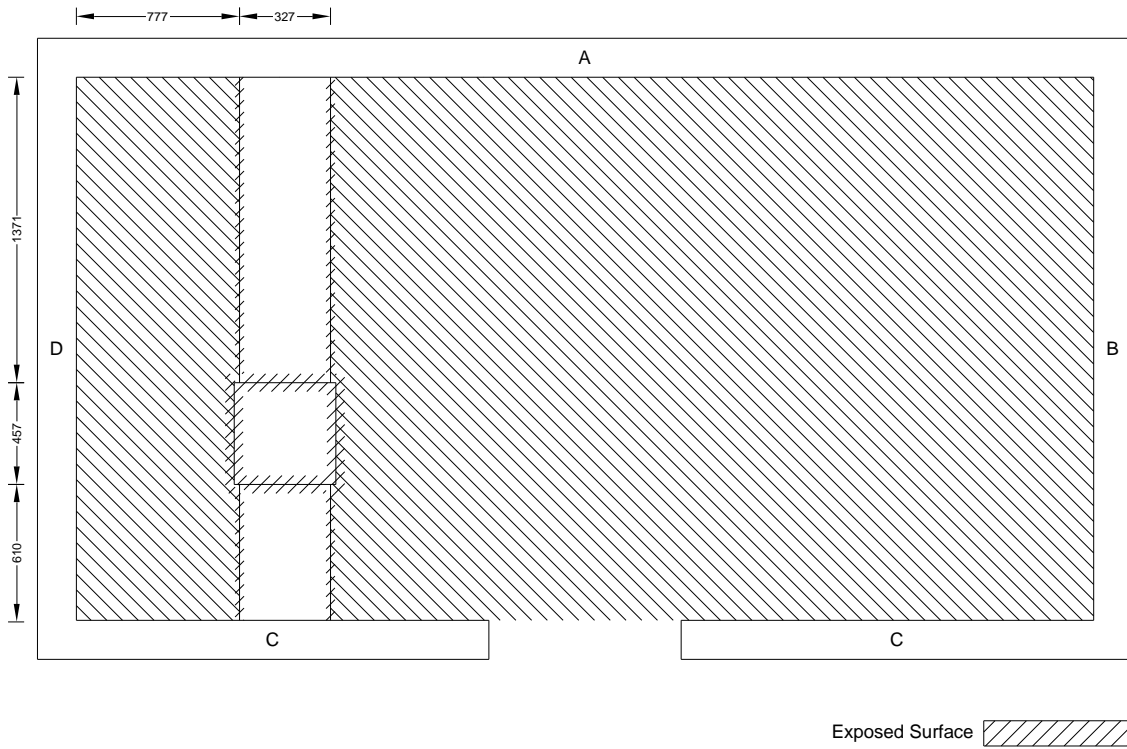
Schematic – fully exposed ceiling, column (4 sides) and beam (3 sides) for Test NLT-1 (even ceiling) and Test NLT-2 (uneven ceiling).
